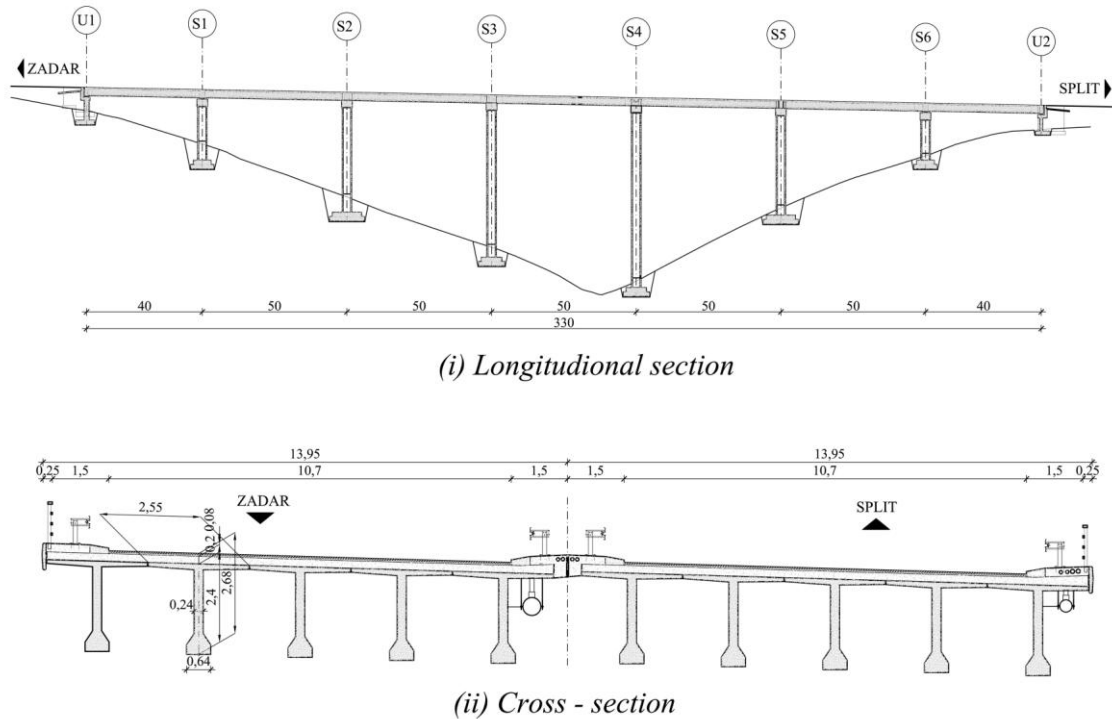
Longitudinal and cross – section of the Dabar Bridge
